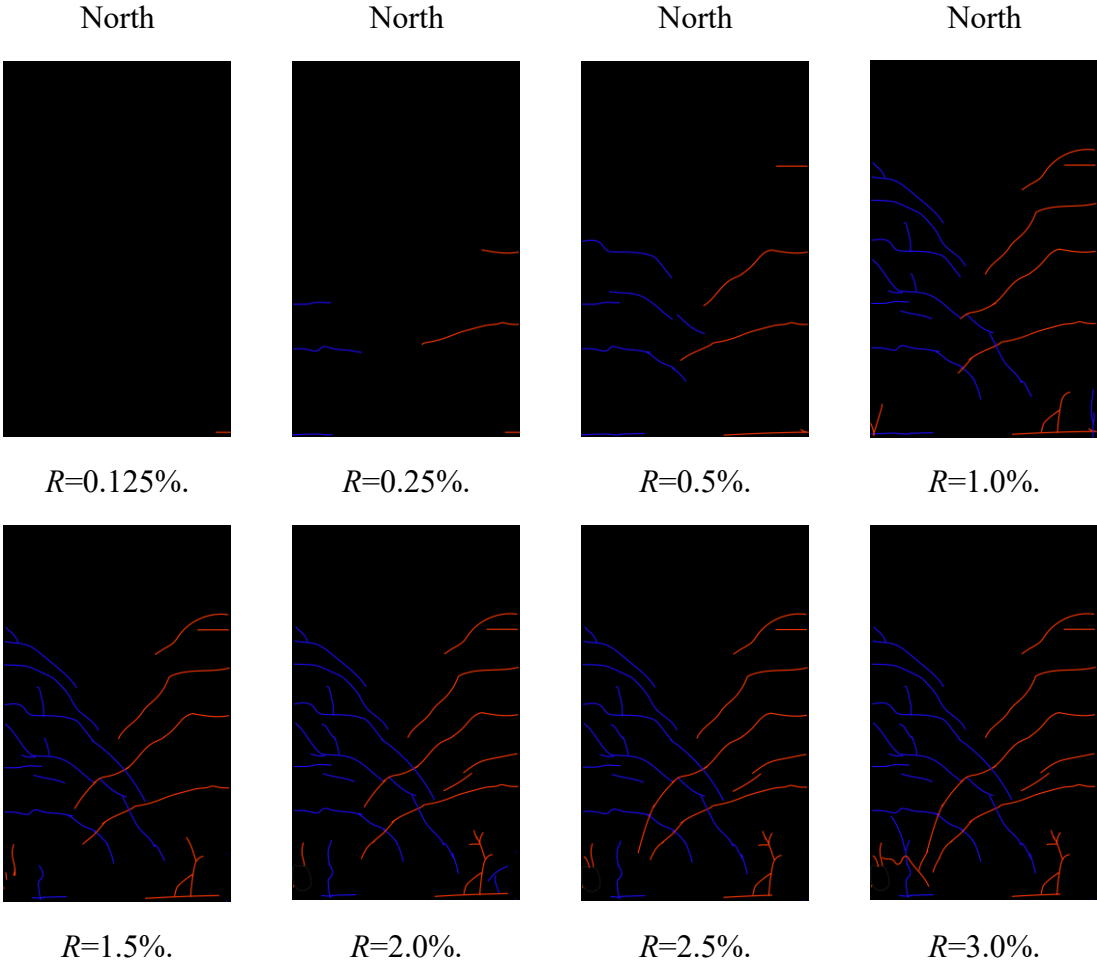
Cracks patterns observed on specimen WP20-D10H35-15
